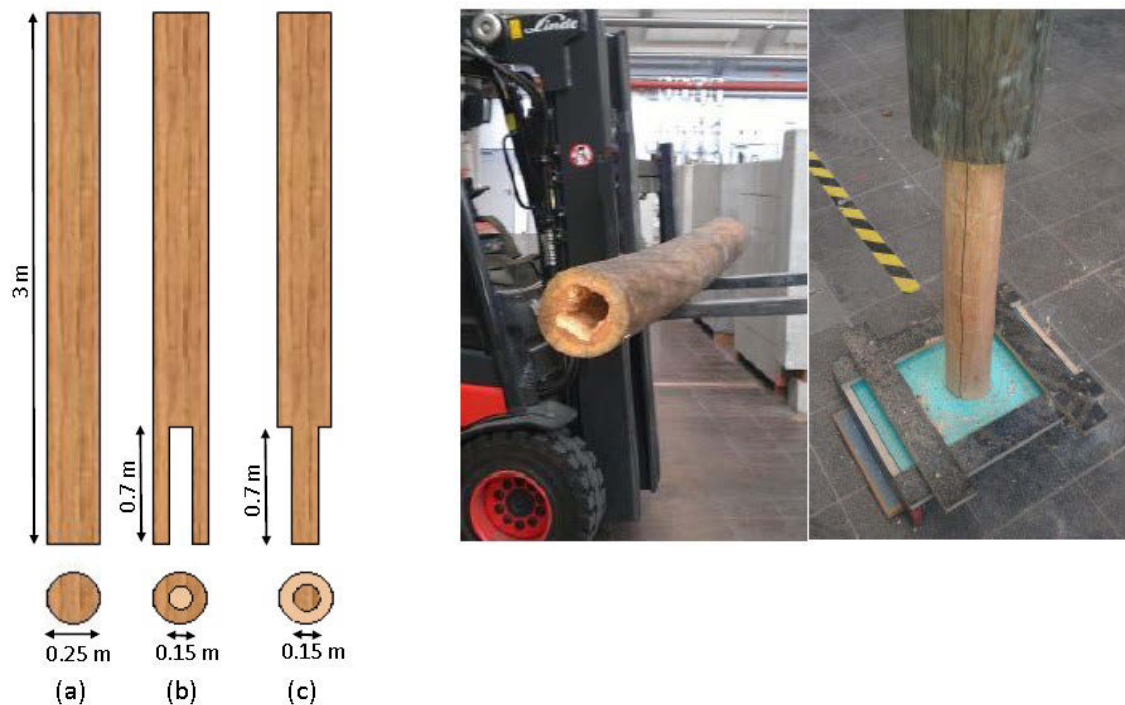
Damage configurations and dimensions of tested poles in longitudinal-section and cross-section view (a) intact pole (b) internal void damage (c) external circumferential cross-section loss damage (Dackermann et al., 2015)
